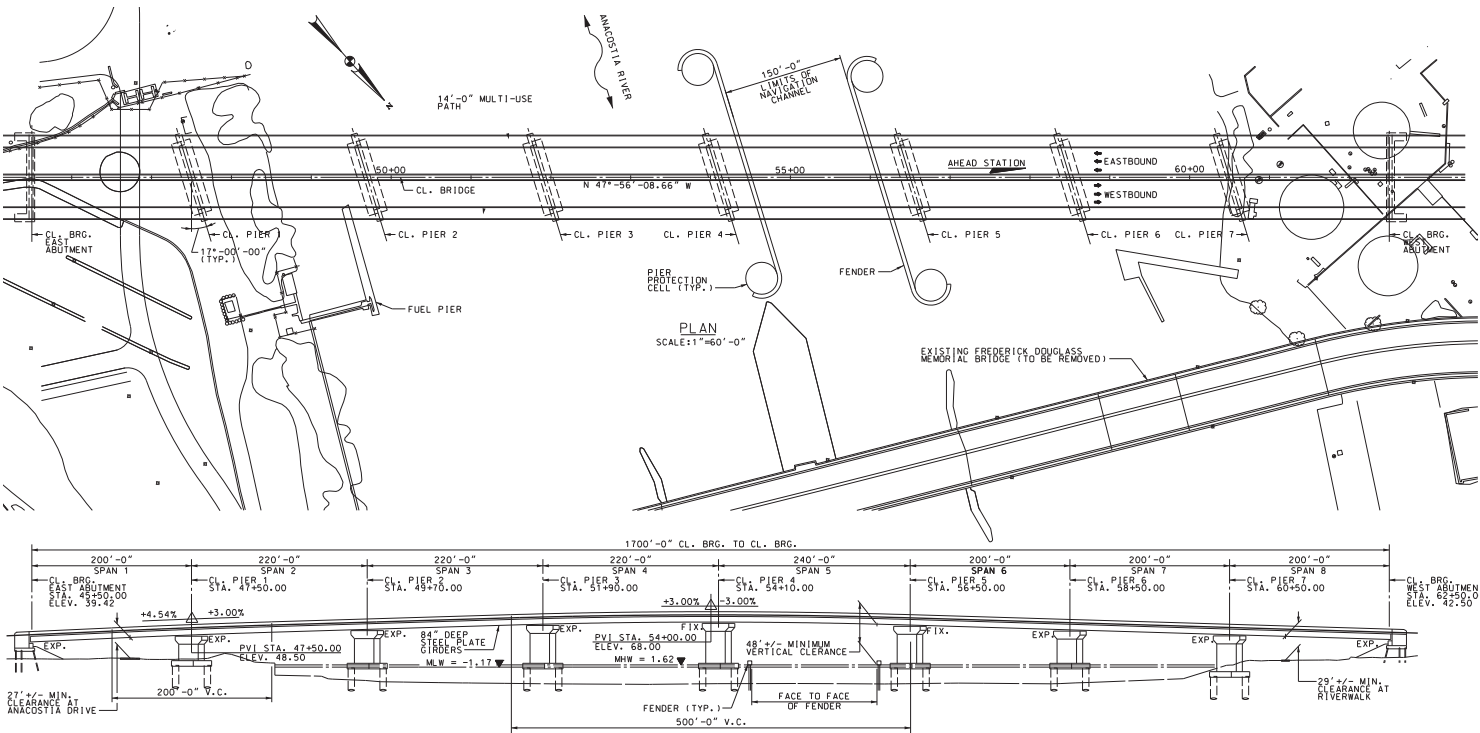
Bridge Alternative 1 - Plan and Elevation
